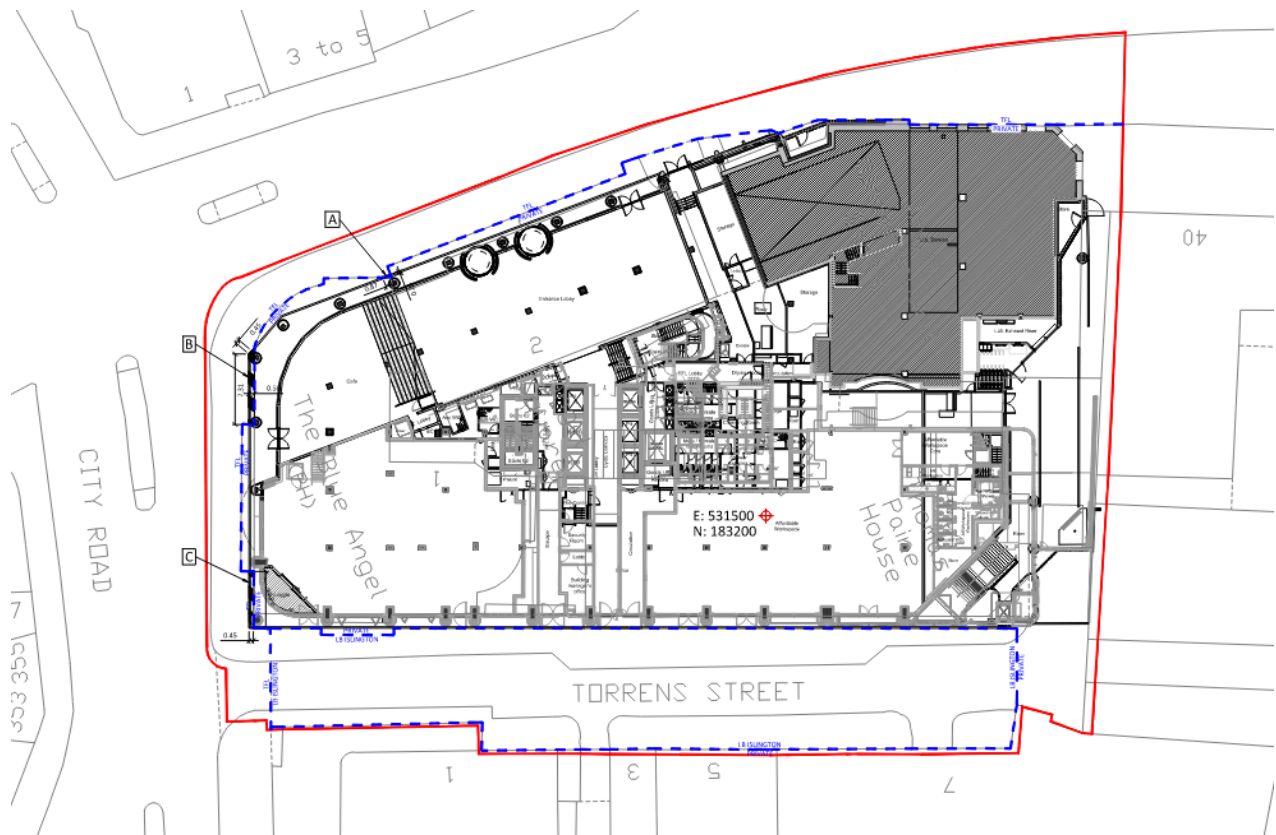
Ground Floor Plan / Stopping Up Order Plan
